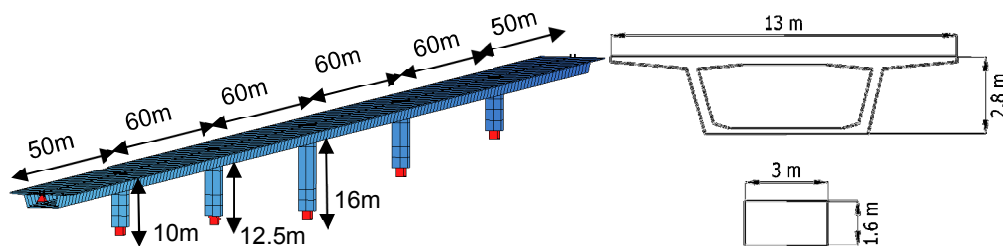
Bridge example global geometry and typical deck/pier cross sections
